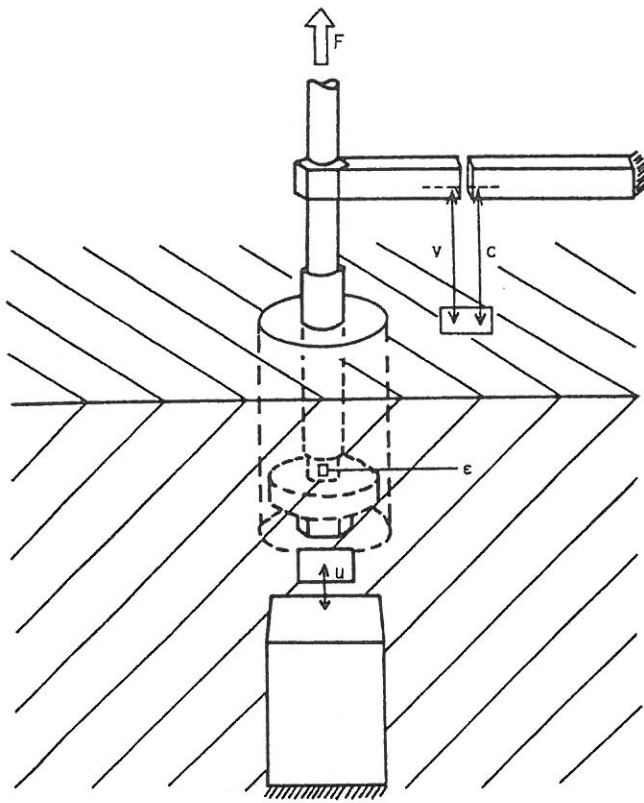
Standard measurements. F = applied anchor load, v = anchor head displacement relative to concrete foundation, c = vertical displacement of concrete foundation, u = horizontal displacement of concrete foundation, and ϵ = strain in anchor bolt
